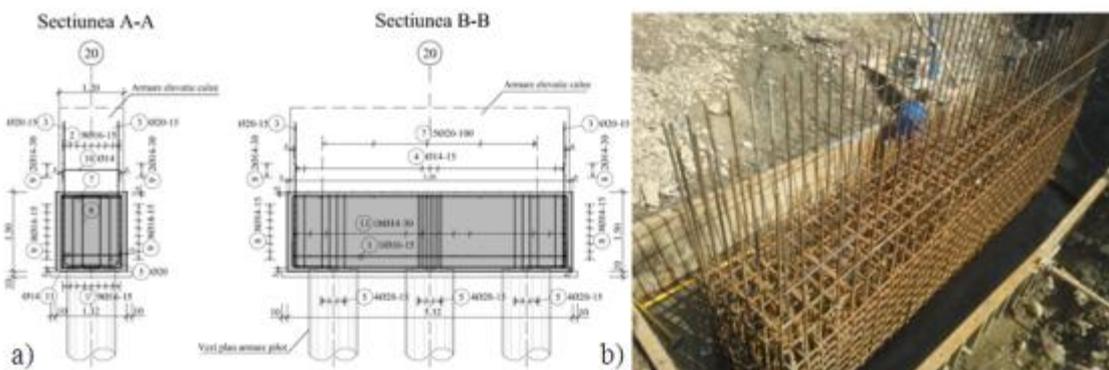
Foundation slab reinforcement plan (a), Site photo of the foundation slab reinforcement (b)
